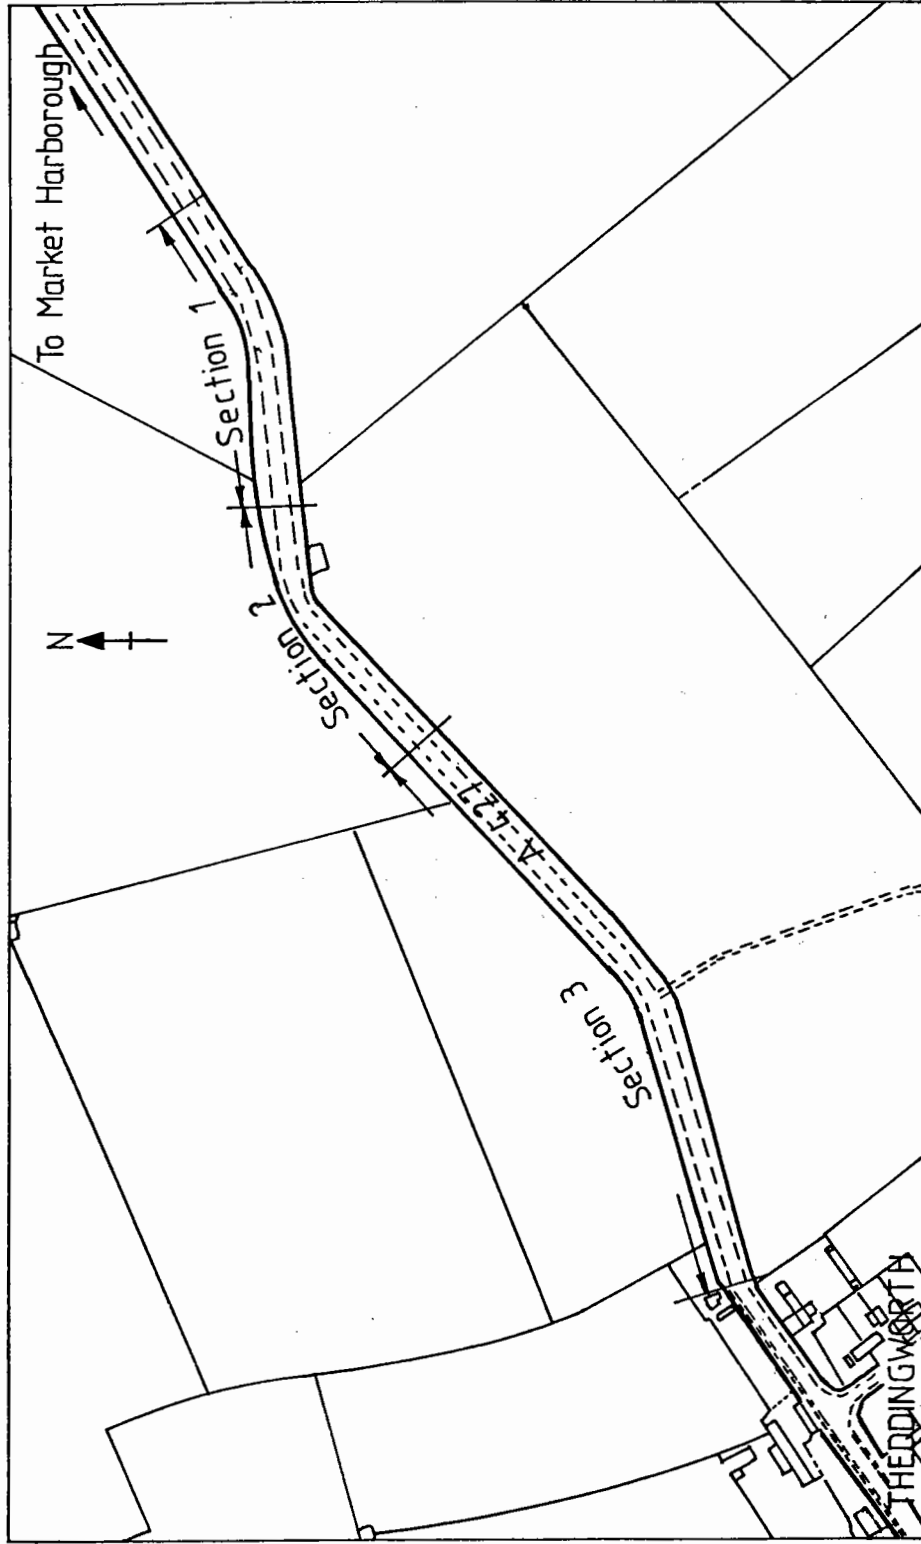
SITE PLAN OF OVERLAY EXPERIMENT A 427 THEDDINGTON
